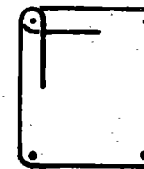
REINFORCING STEEL DETAILING SCHEME
